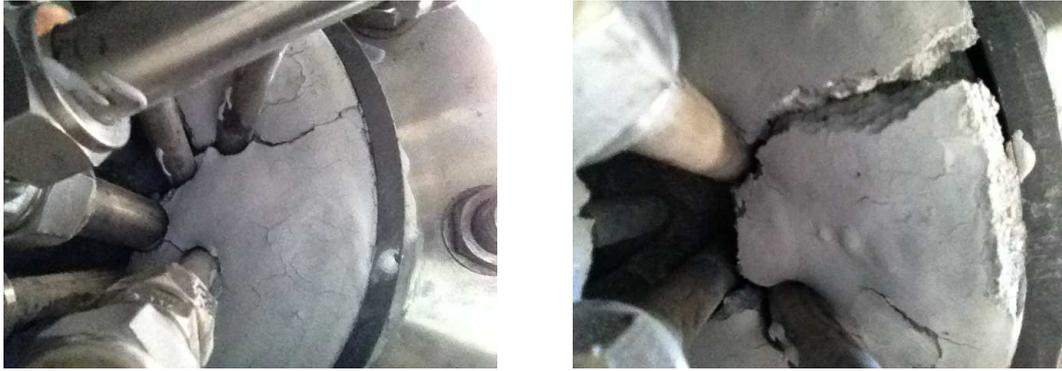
Photos of deformed adhesive material at the top and bottom of the column
